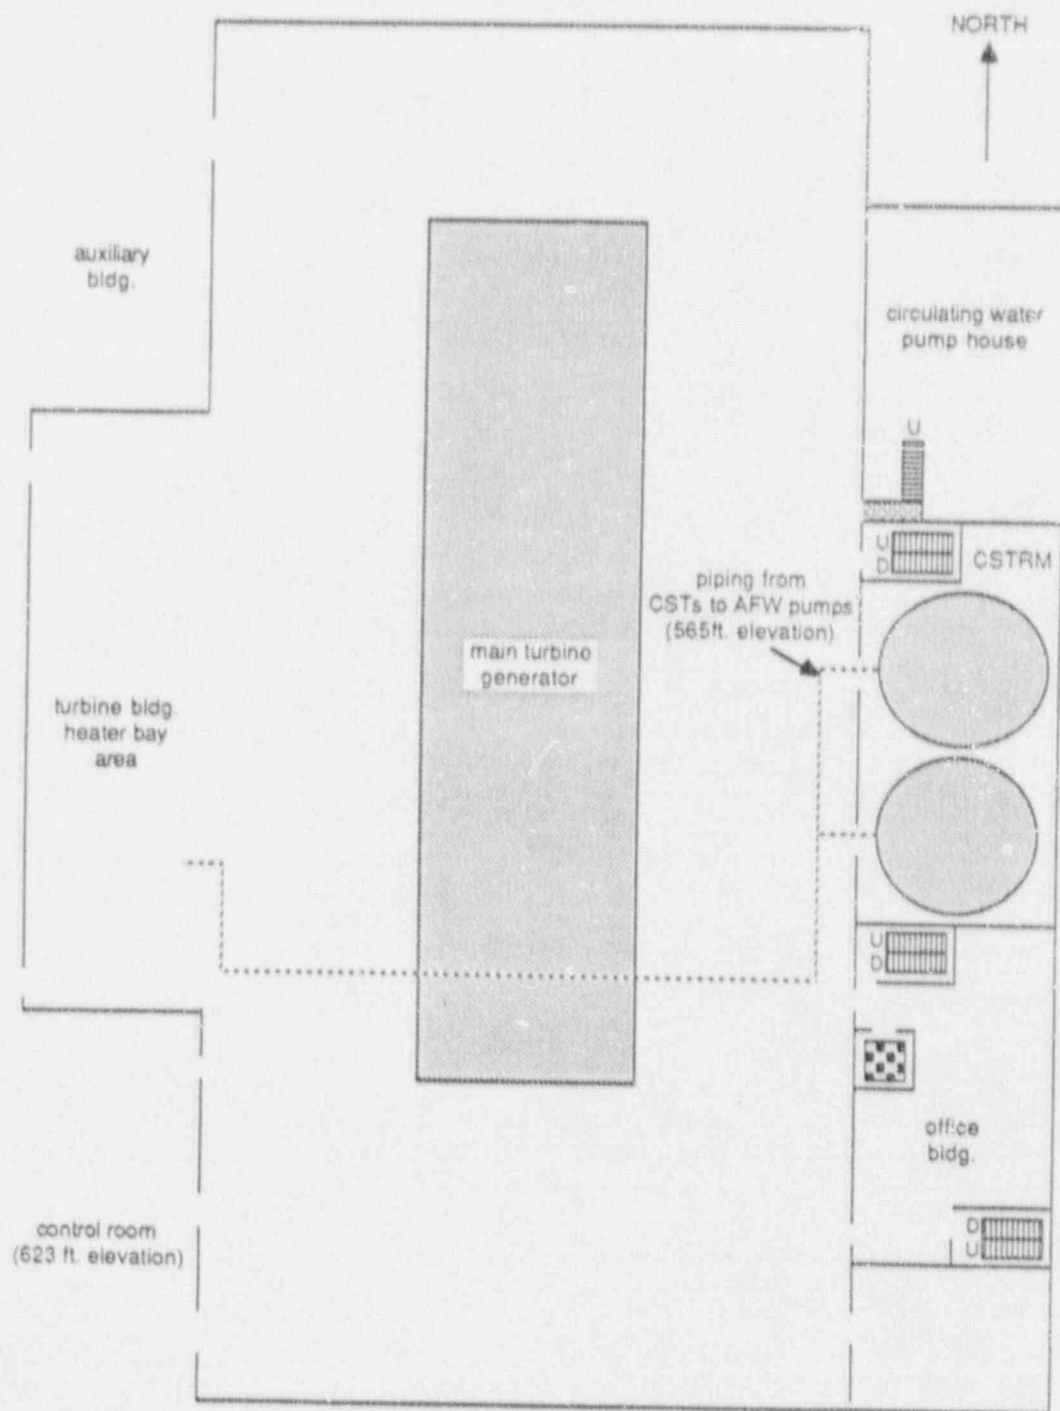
Davis-Besse Turbine Building, Elevation 565 to 623 feet (typical)
